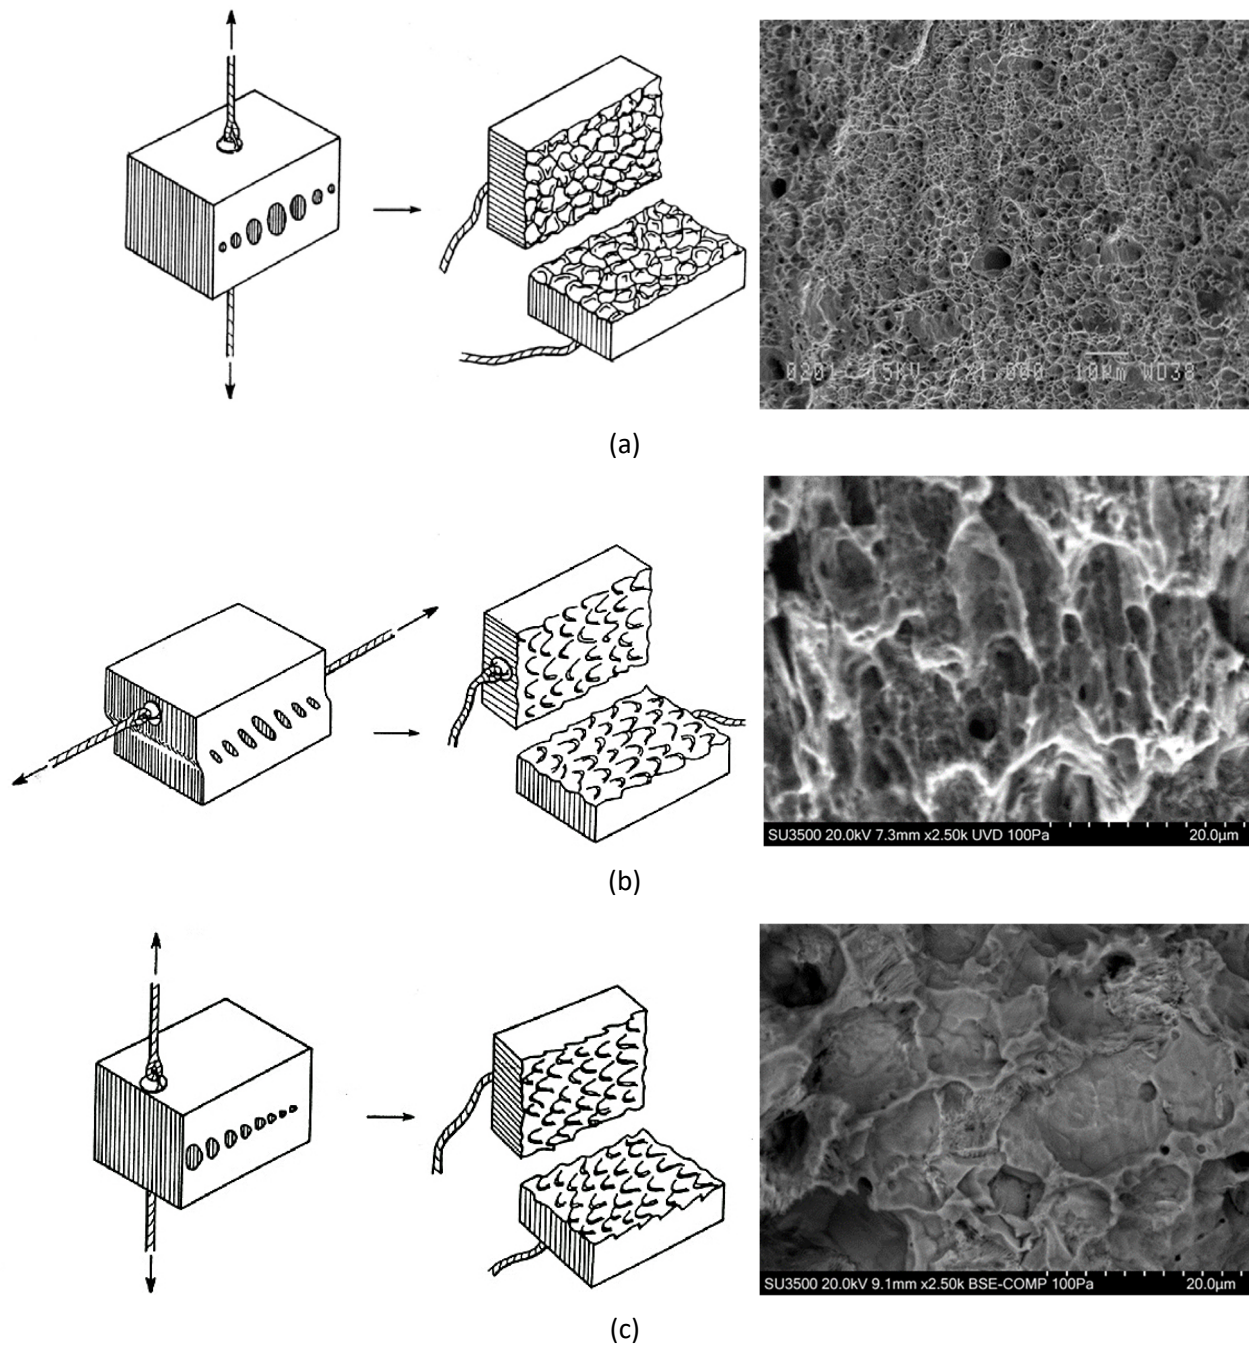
Rockbolt fracture morphology as a function of loading mechanism (Hadjigeorgiou & Thorpe 2020). (a) Tension: equiaxed dimple formation on both fracture surfaces; (b) Shear: elongated dimples pointing in opposite direction of matching surfaces; (c) Tensile tearing: elongated dimples point toward fracture origin on matching fracture surfaces
